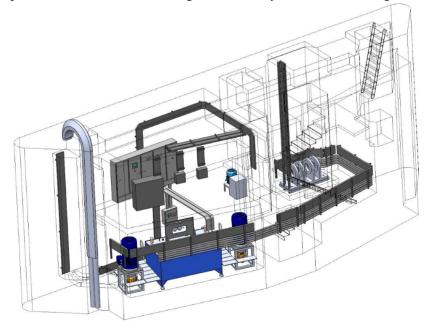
3D model of plant room showing how full the pivot pier was even without a counter-weight
